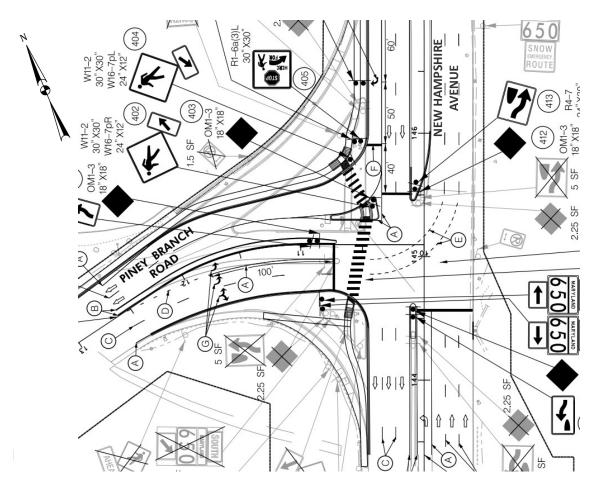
Redesigned Piney Branch Road at New Hampshire Avenue Intersection
